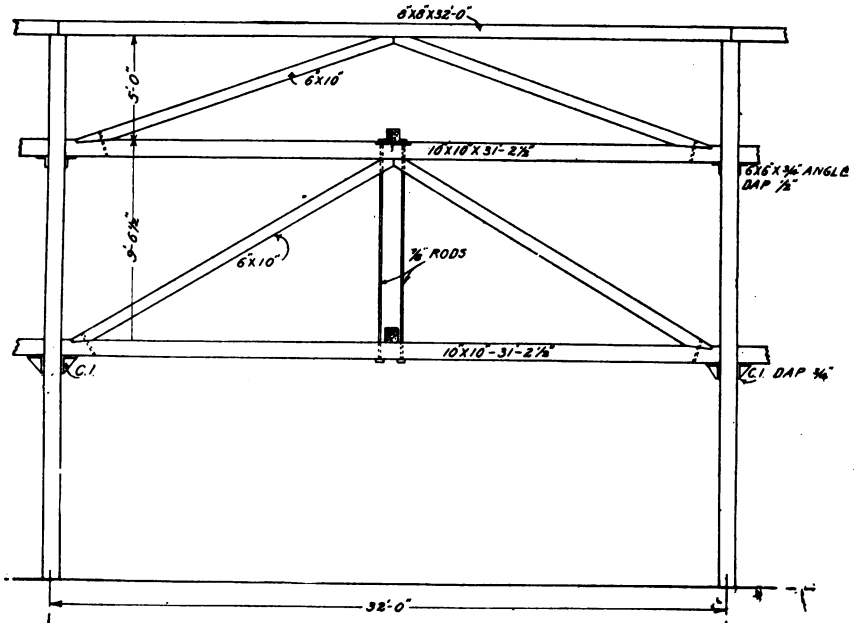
Partial end elevation of a planing mill building and design of trusses to eliminate interior posts.
